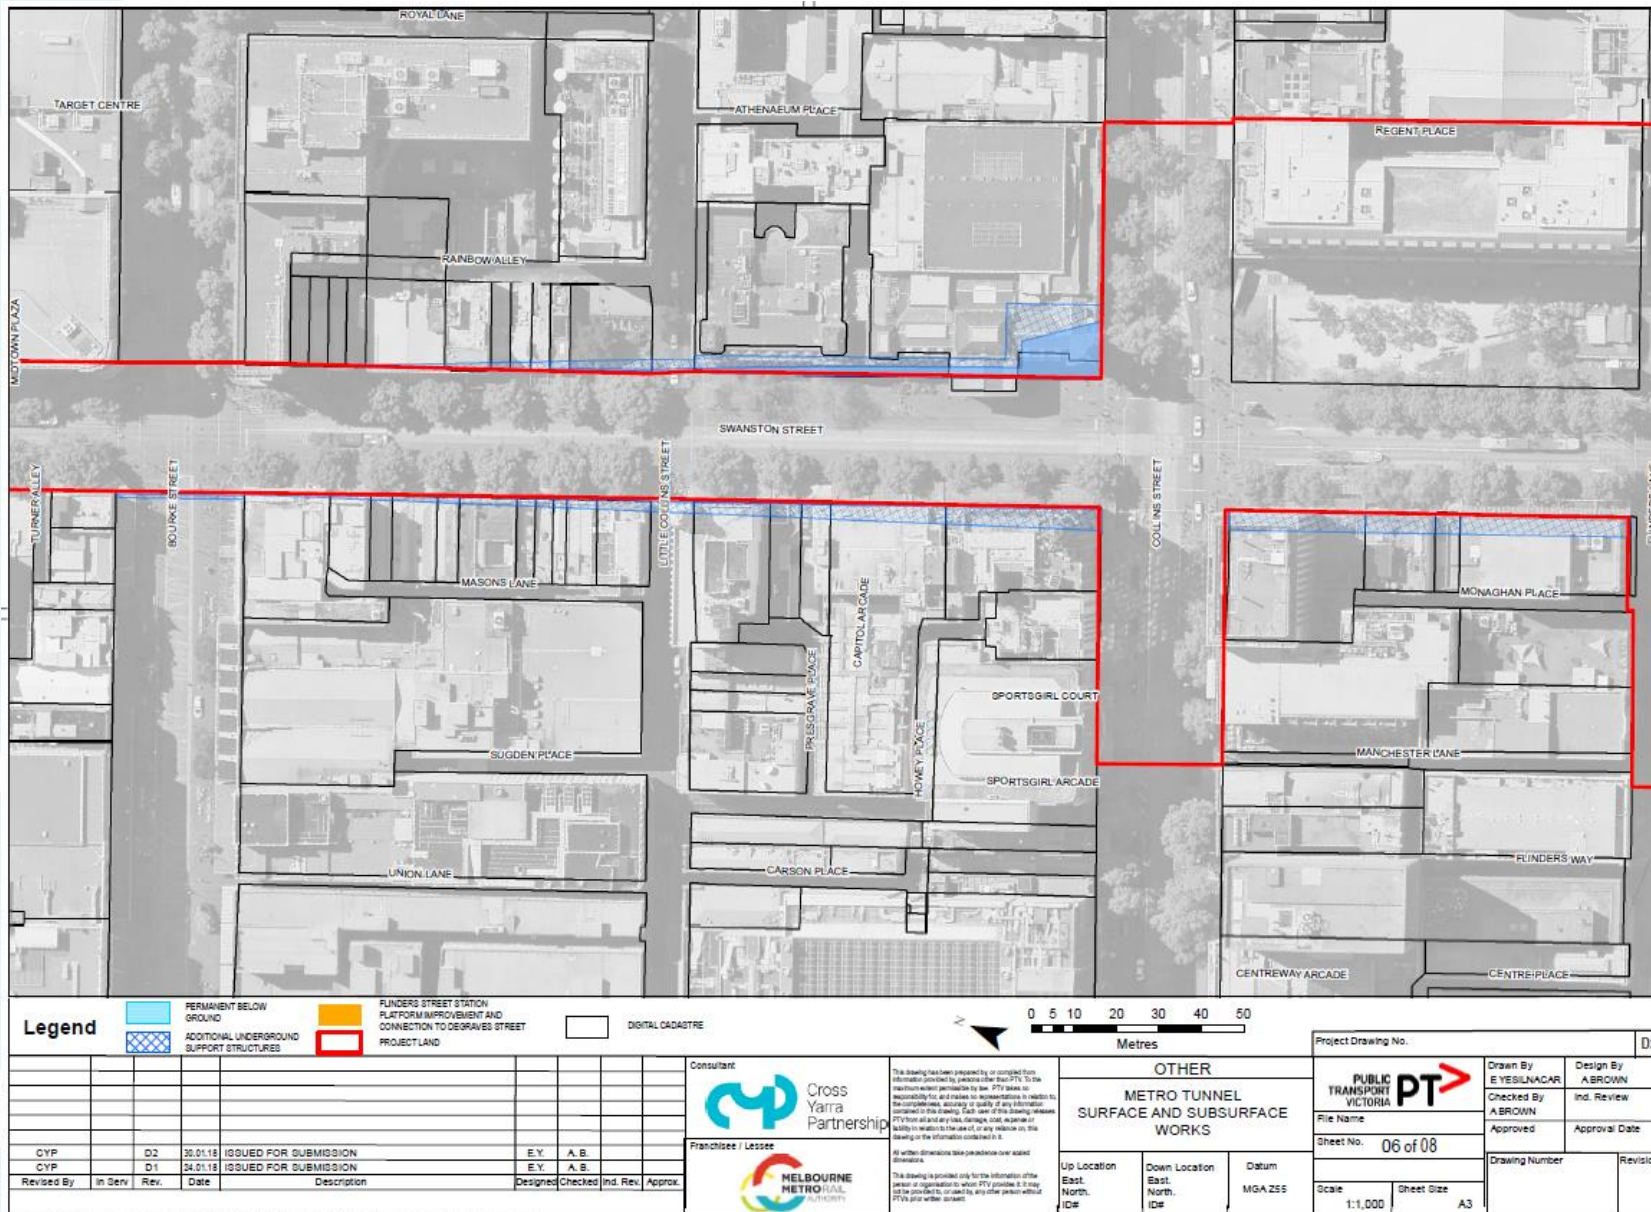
ADDITIONAL PROJECT LAND REQUIRED FOR PERMANENT BELOWGROUND AND UNDERGROUND SUPPORT STRUCTURES AT CBD SOUTH STATION
